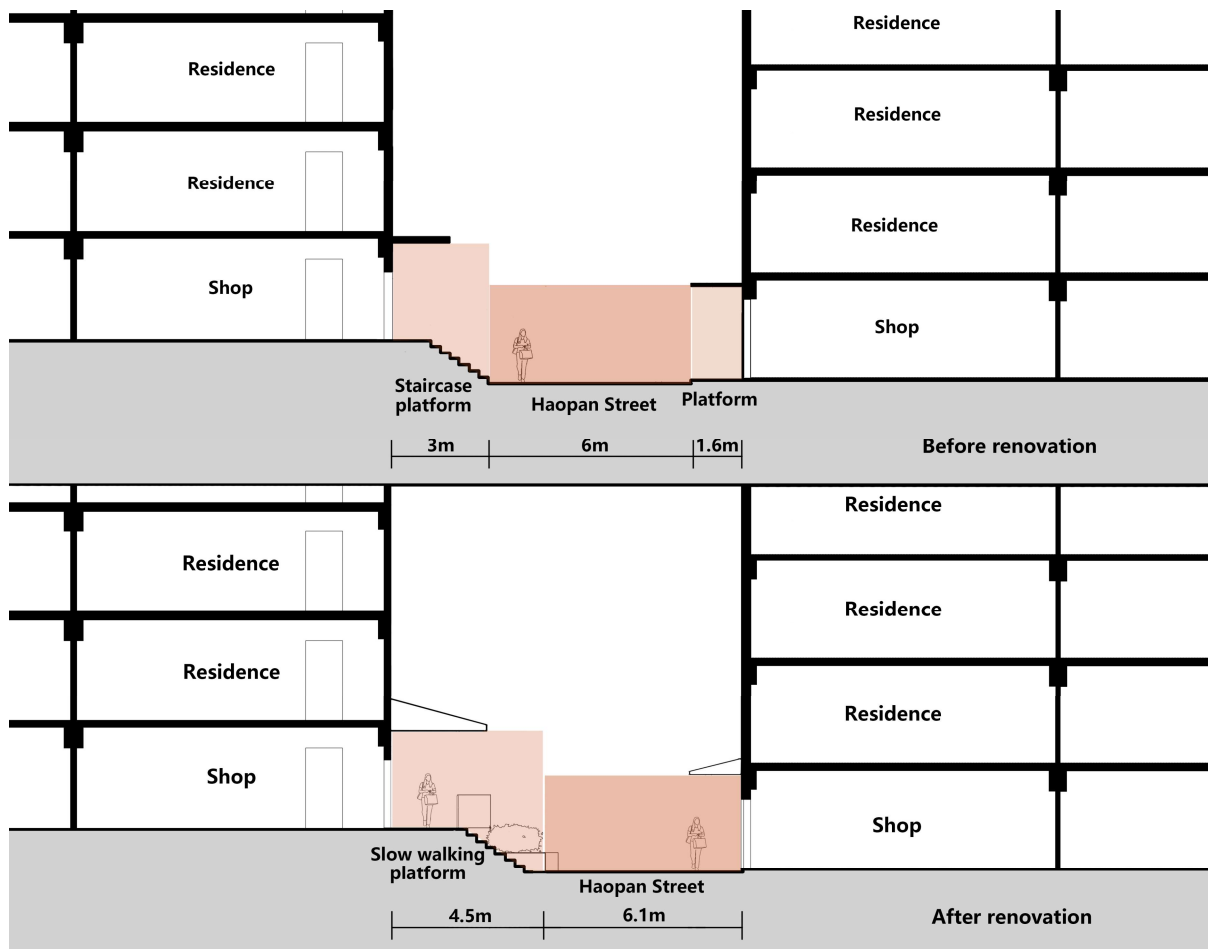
Street Node 3 Pre - and Post Renovation Sectional View
